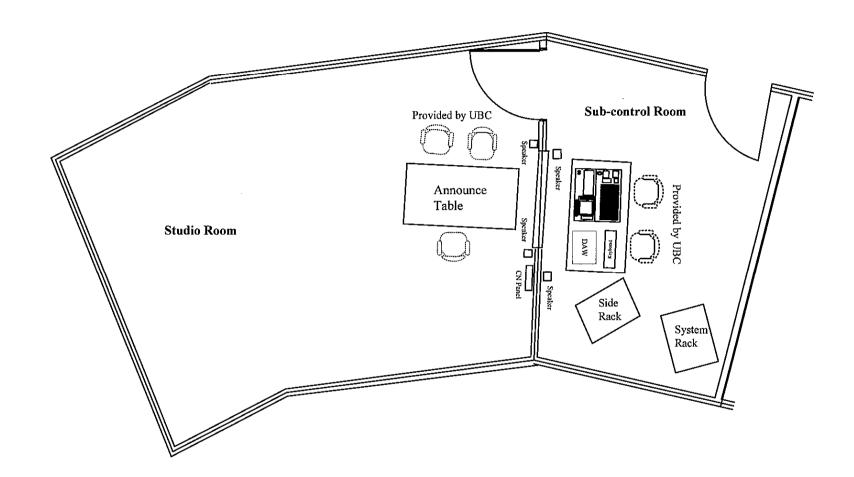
Kampala Studio / Equipment Layout Plan of Production Studio for D,E and F Studio S=1/50
